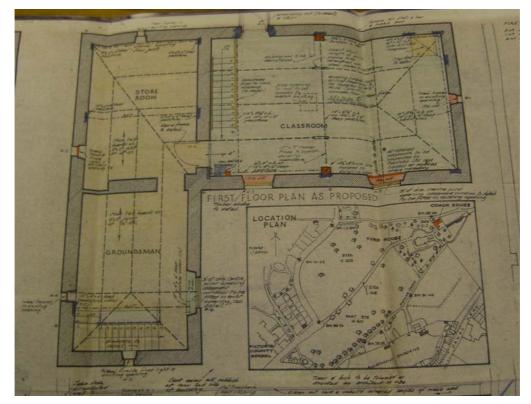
Coach House first floor plan as proposed in 1966 (BDB 33/12/9 1966-9)
